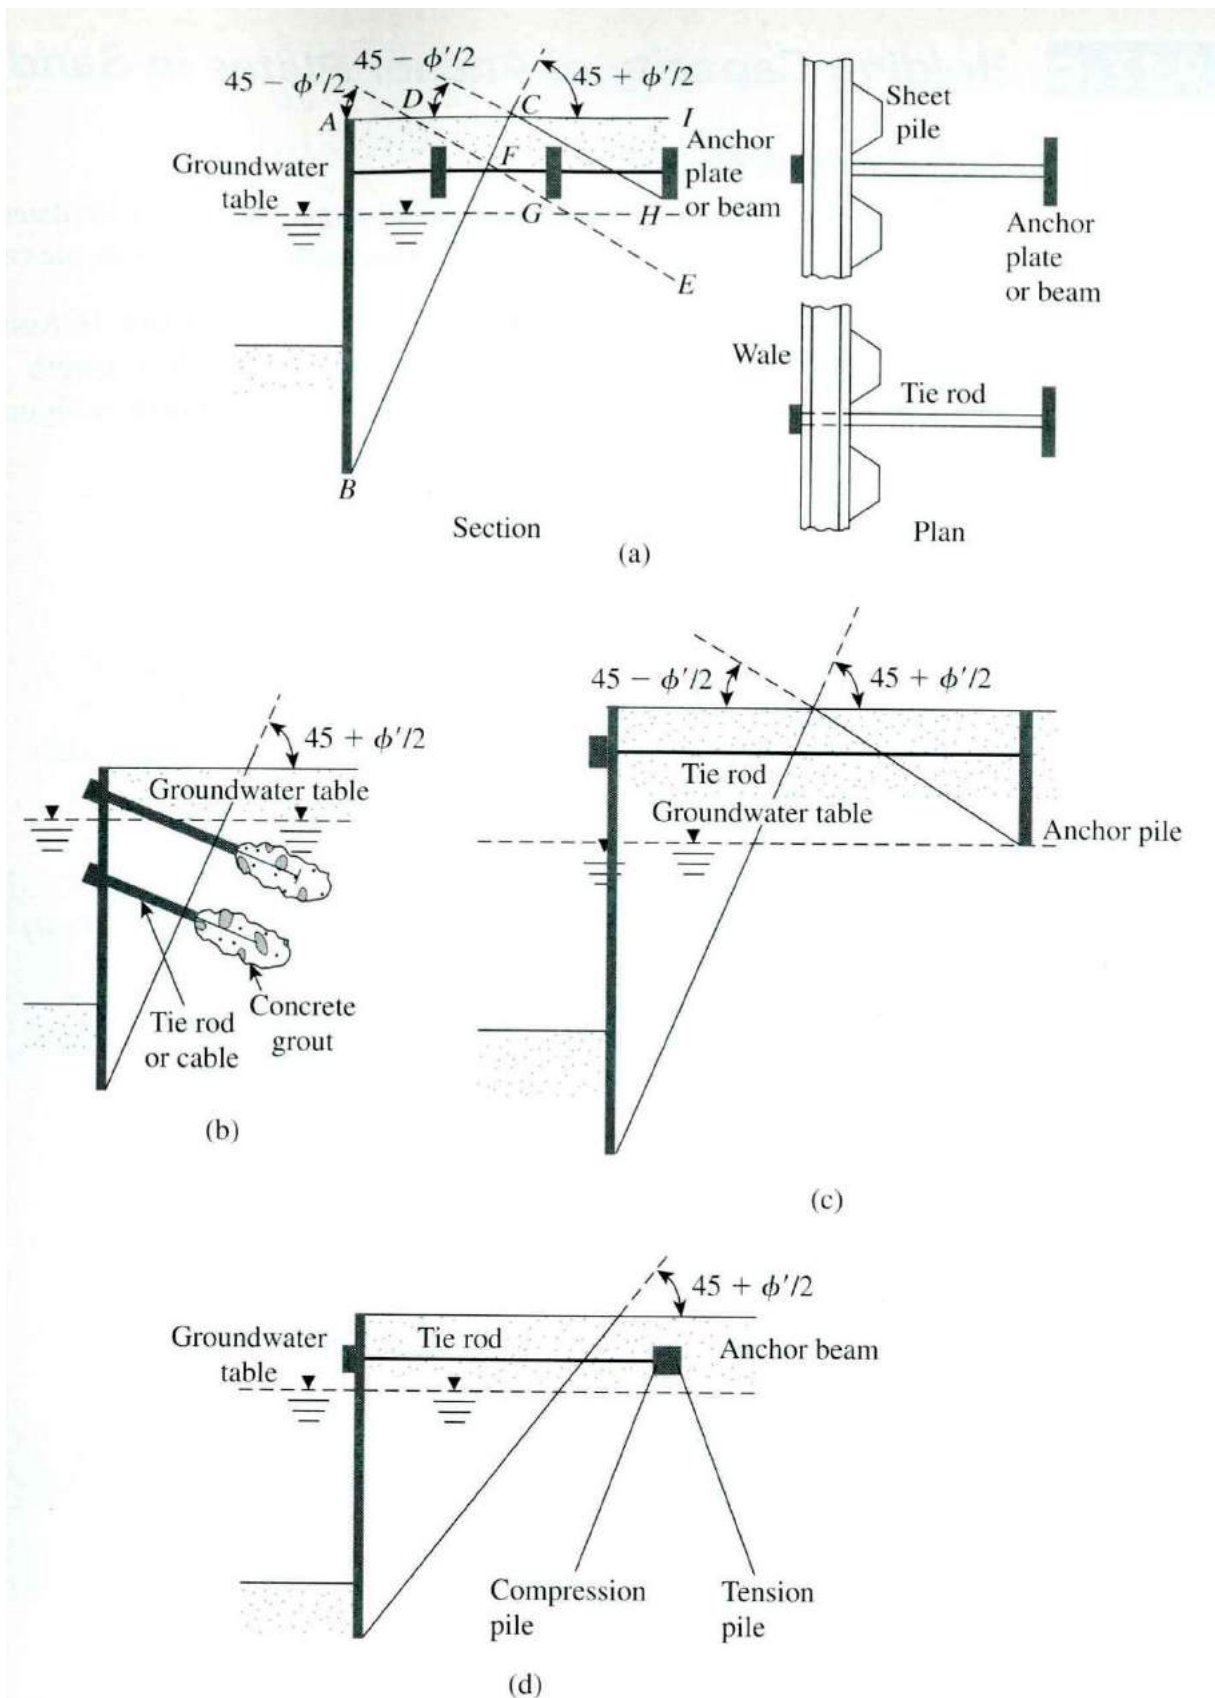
Various types of anchoring for sheet-pile walls: (a) anchor plate or beam; (b) tieback; (c) vertical anchor pile; (d) anchor beam with batter piles
